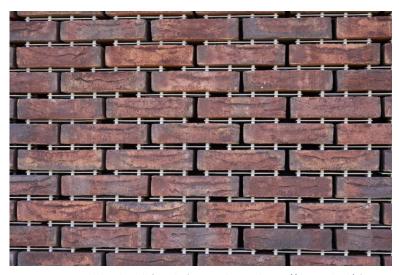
Drystack brick wall façade (Drystack BV < https://drystack.nl/>)
